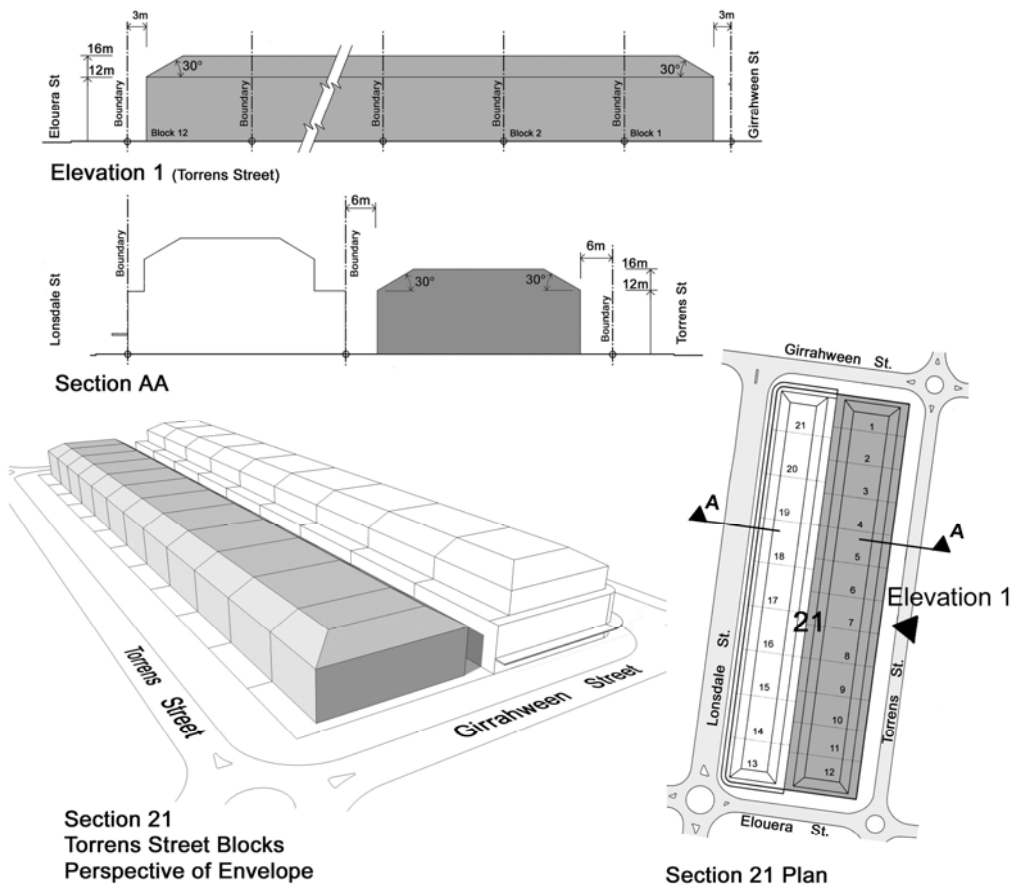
Building Envelope Diagram - Braddon section 21 blocks 1- 12
